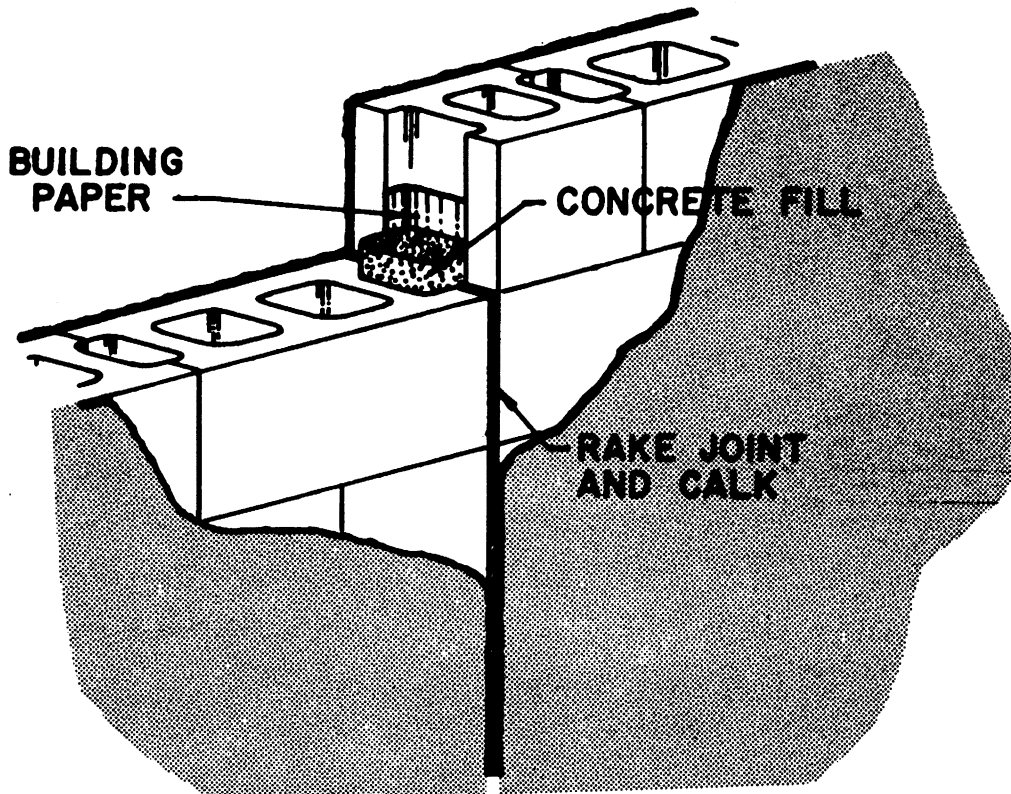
One type of control joint. The joint must extend the full height of the wall.
